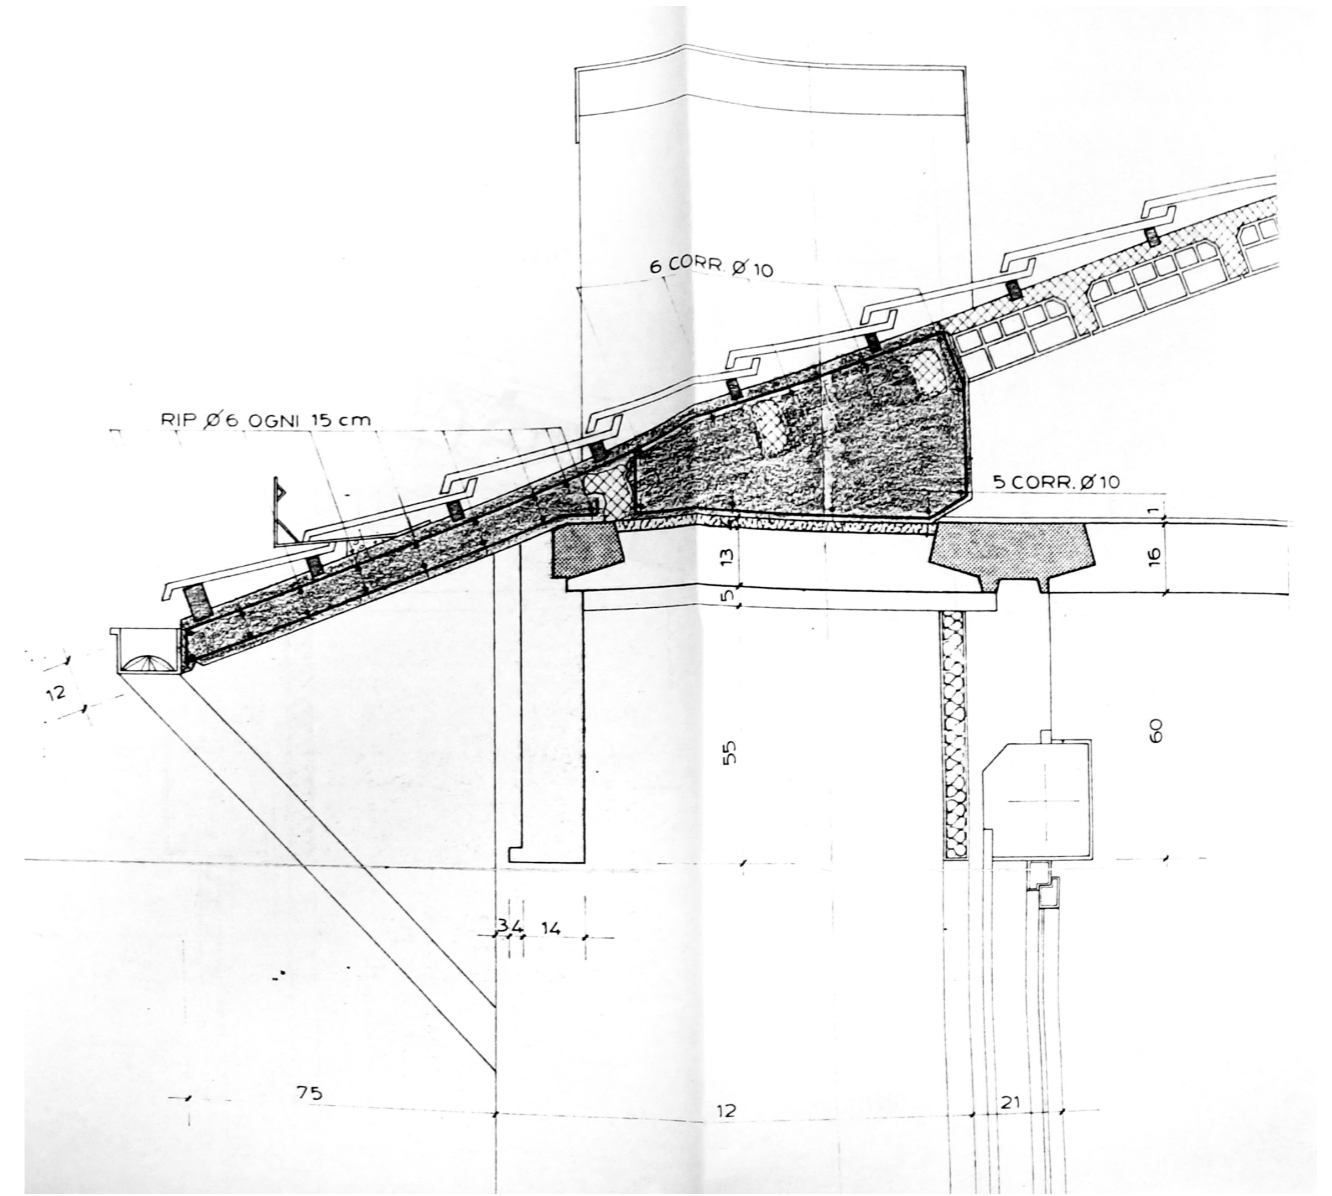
Detail Section of the roof after the extraordinary maintenance on 1985 (from ATC Archive)
